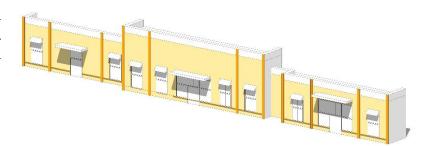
Outlot/Liner Commercial Building Type Articulation
